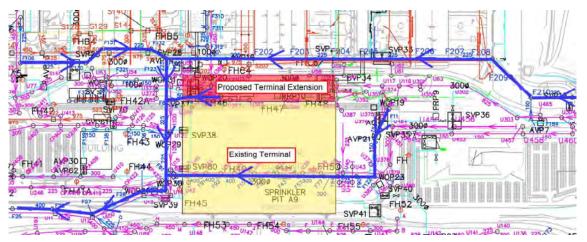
Existing foul water layout – Source: STAL-BV-22742-C-2000 P01
